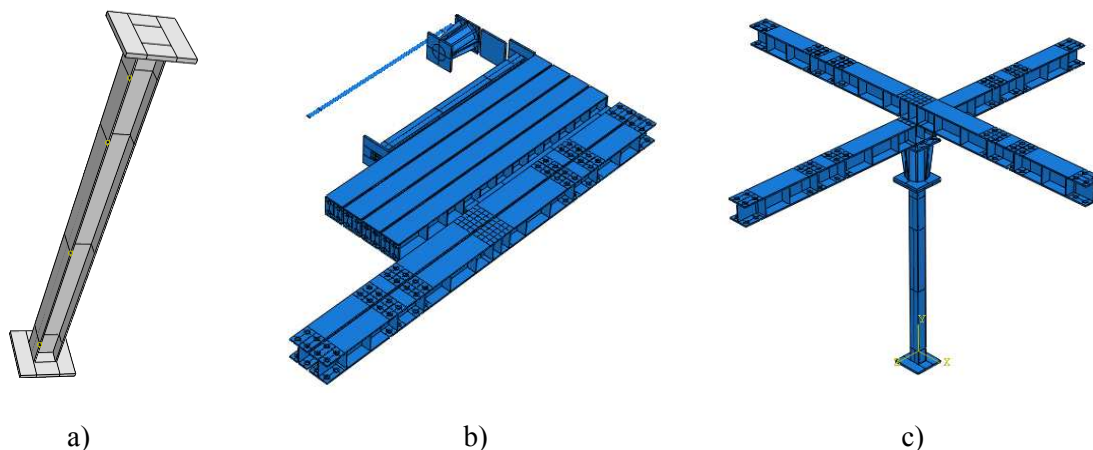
Construction of the 3D-model a) column b) several parts c) view of the assembly
